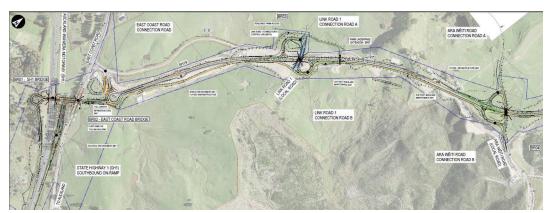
Extract from the July 2023 Penlink General Arrangement Plans, currently under construction, showing Link Road 1 near the centre and Link Road 2 to the right
